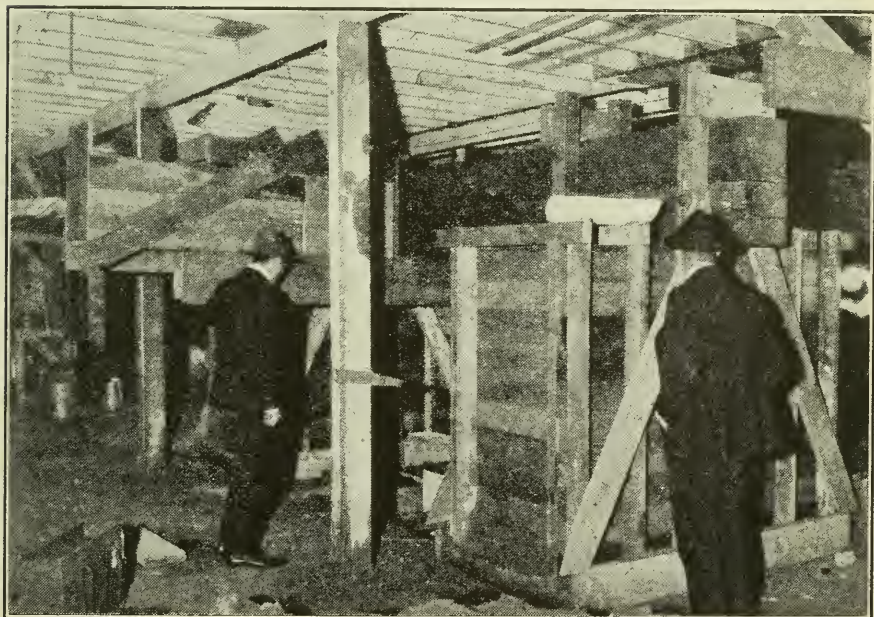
SOIL TESTING APPARATUS IN POSITION.
